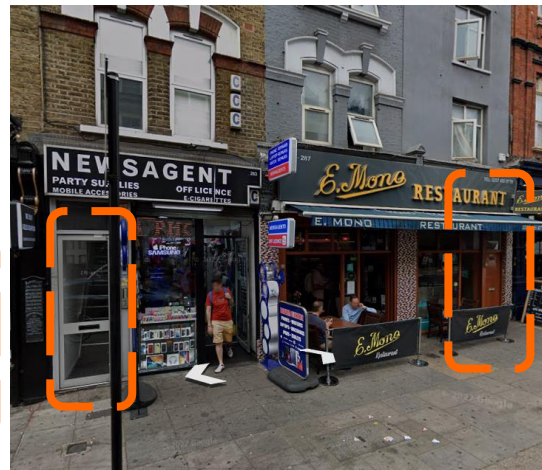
Dedicated entrances to the upper floor levels to nos. 283 & 2285-587 Kentish Town Road.
